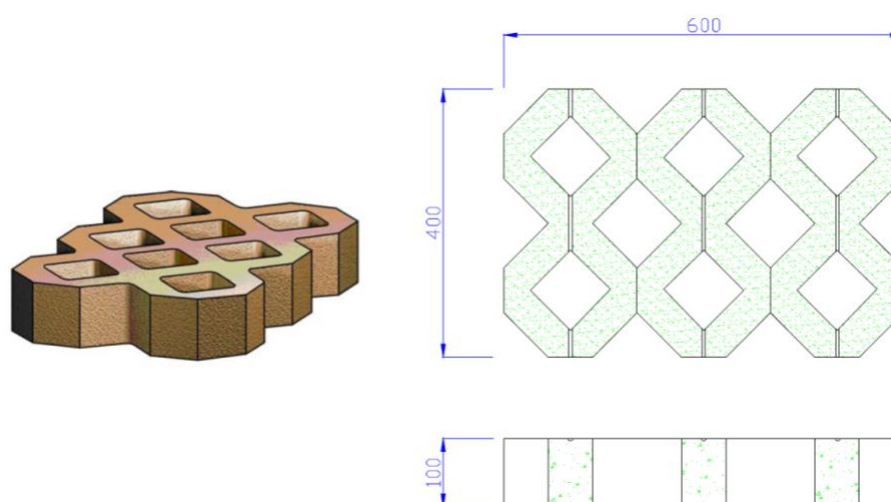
Prefabricated concrete permeable blocks (Source: Alberdi).
